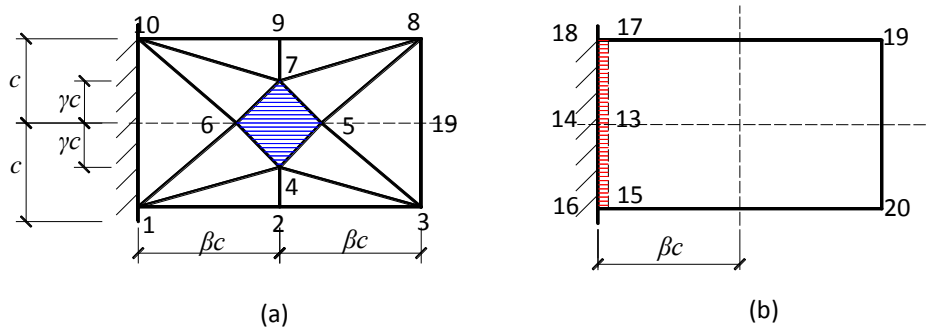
Flange yield line mechanism (a) bottom flange; (b) top flange.
